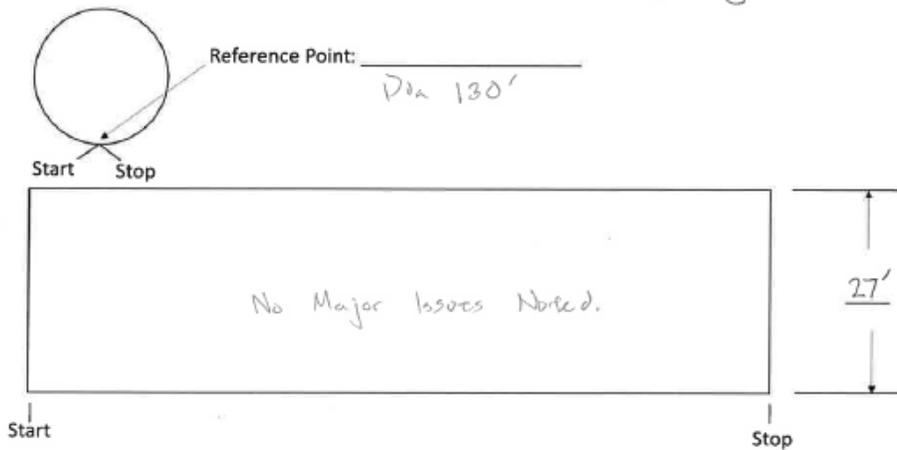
Reservoir INTERIOR WALL Elevation– Note location of ladders and other features.
